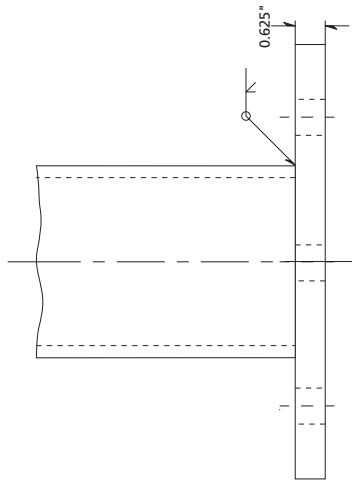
/2" x 3-1/2" x 3/16" BASEPLATE ASSEMBLY FRONT ELEVATION
